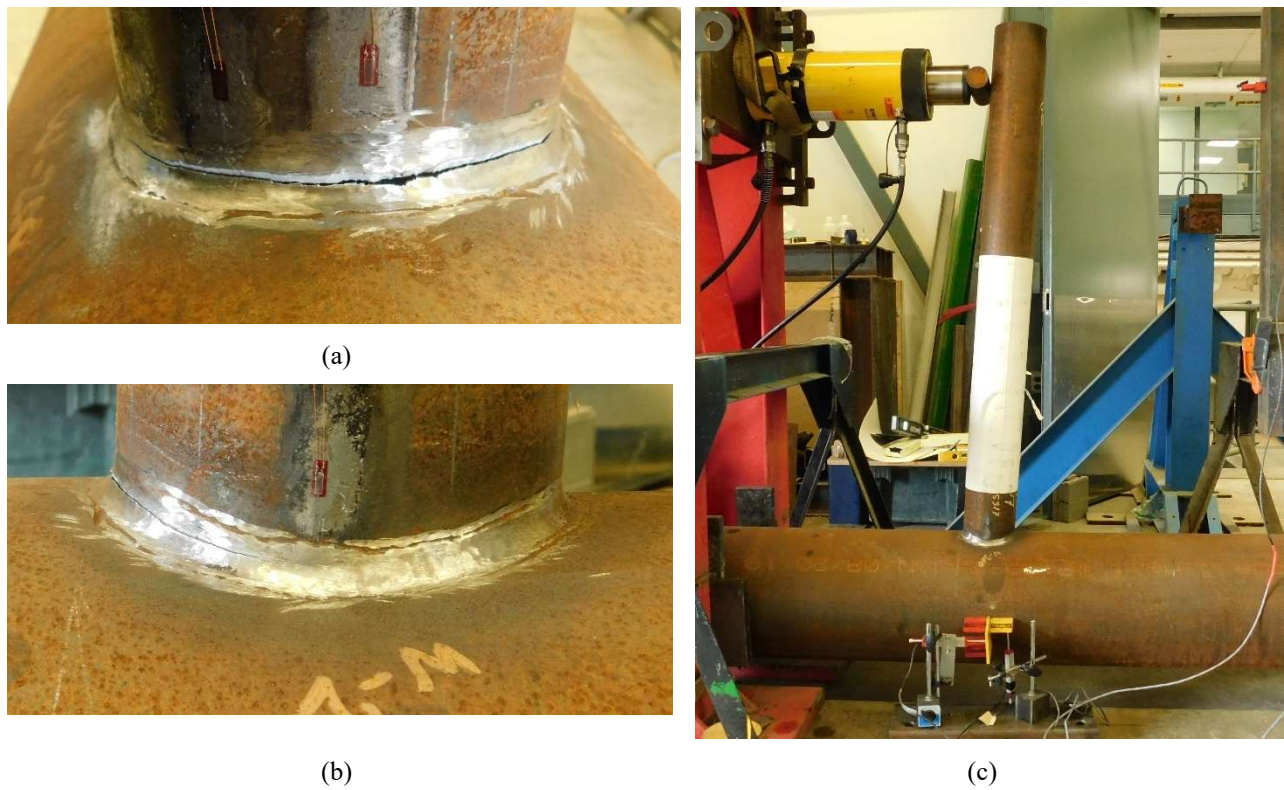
Failure of T324-127-1 (a) weld fracture, (b) chord deformation and (c) branch deformation
